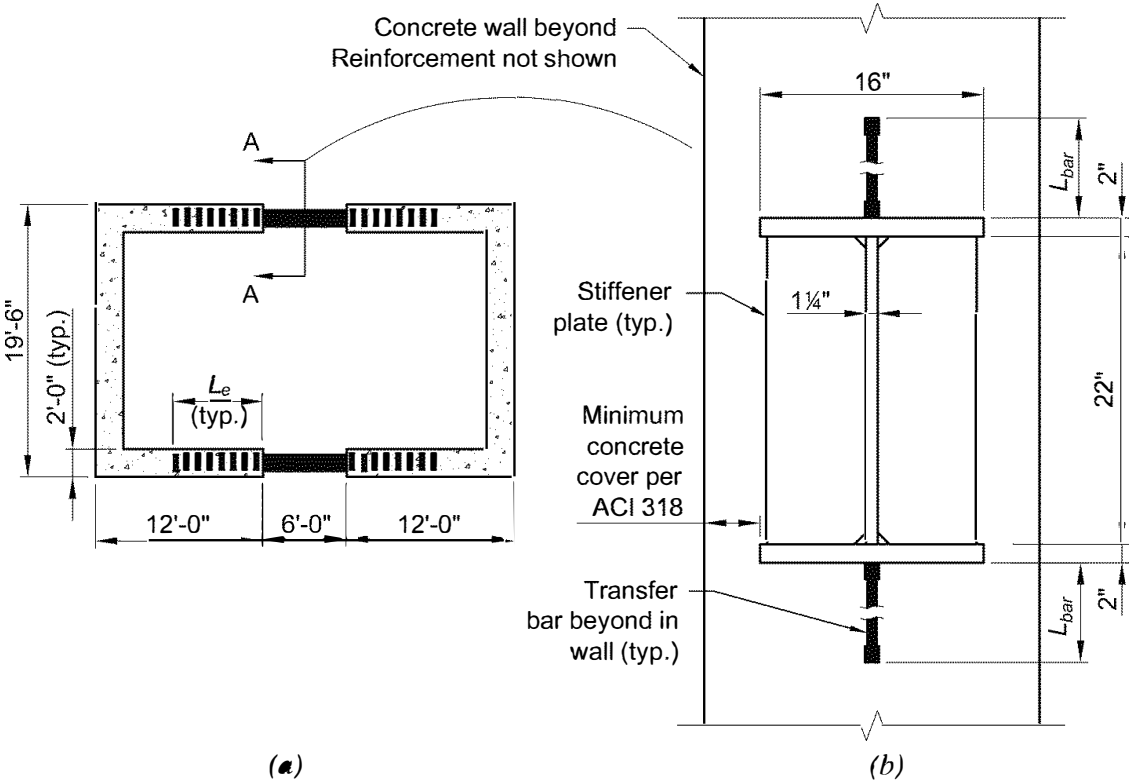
(a) Core plan and (b) Section A-A—beam cross section.
